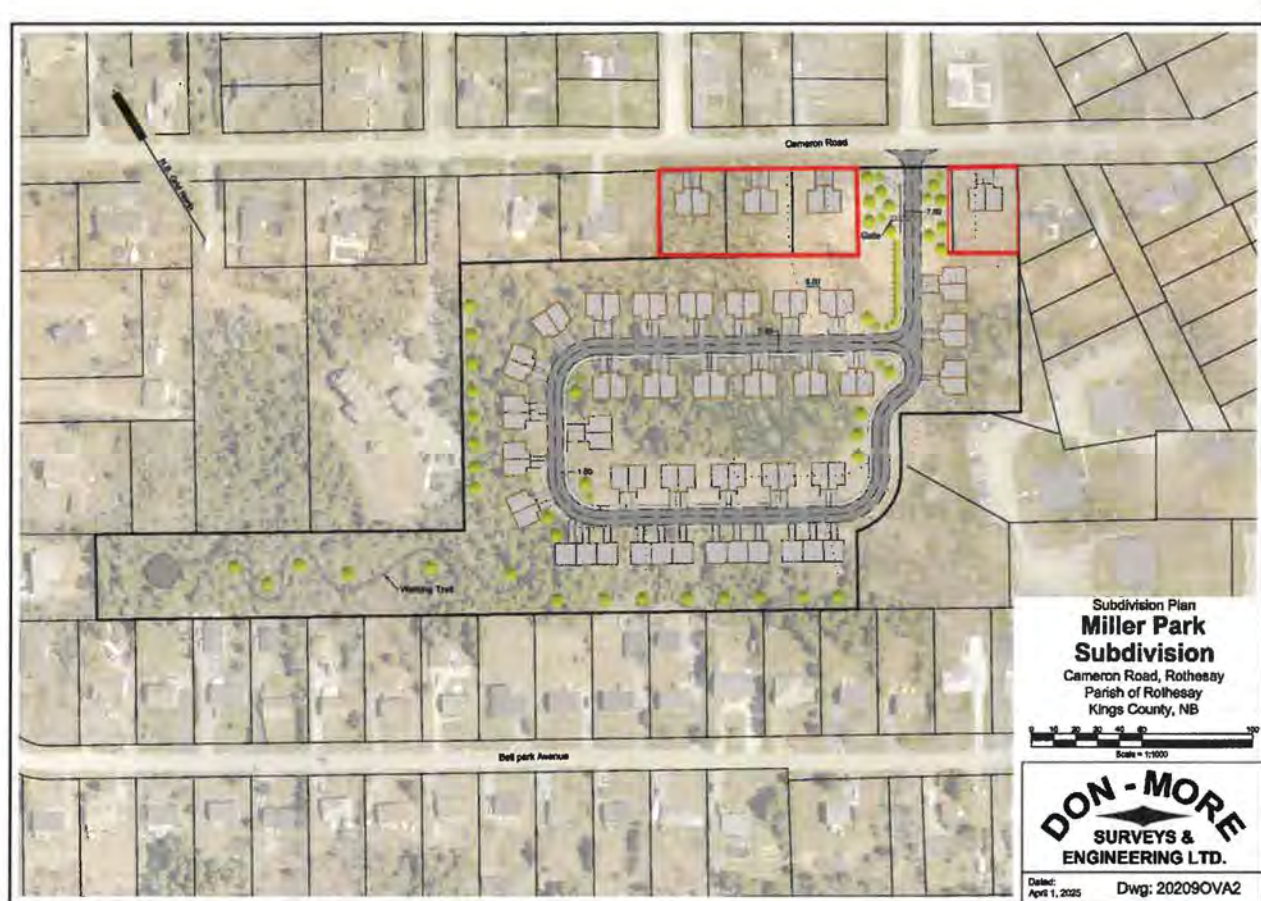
Portion of site to be developed with two-unit dwellings fronting on Cameron Road.
